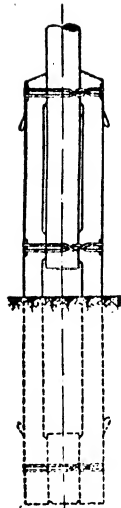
Paired reinforced-concrete attachment of type SPR.
